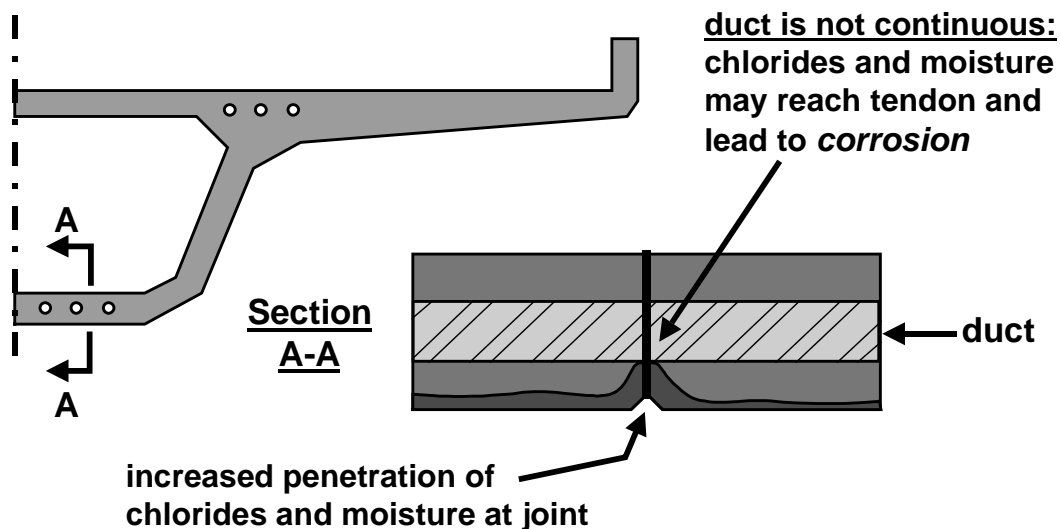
Possible Corrosion Mechanism at Precast Segmental Joints
